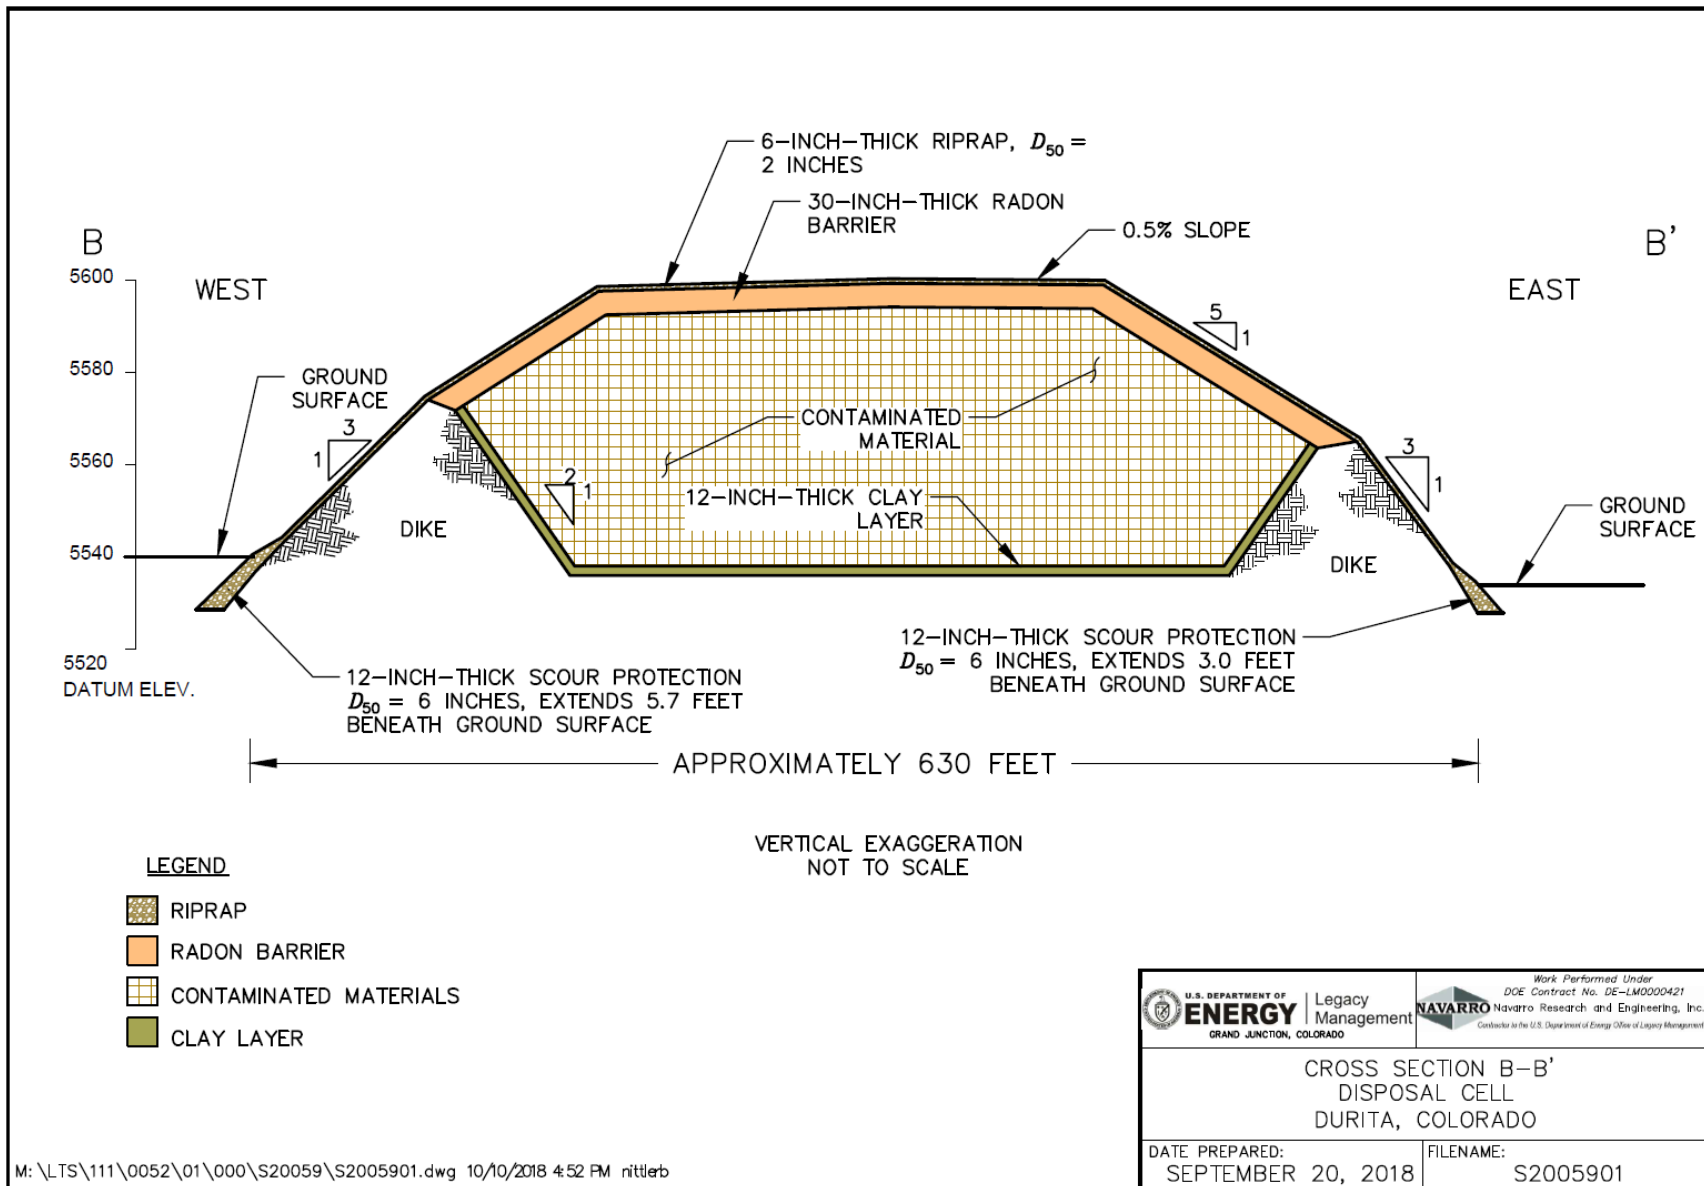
Cross Section, Disposal Cell, Durita, Colorado, Disposal Site
